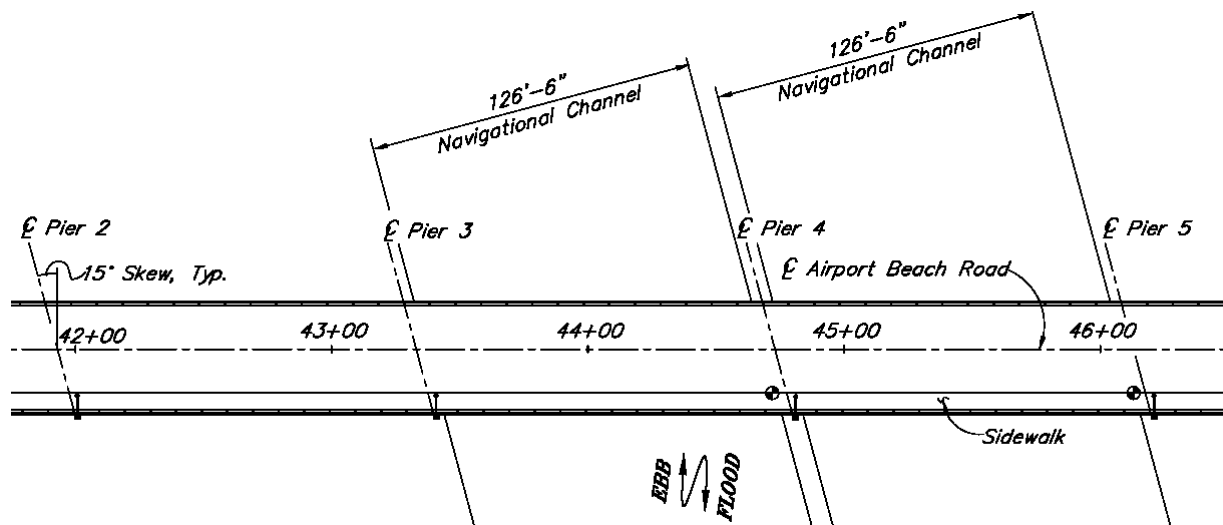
Bridge plan view indicating navigation channel width dimensions. (Source: Alaska DOT)
